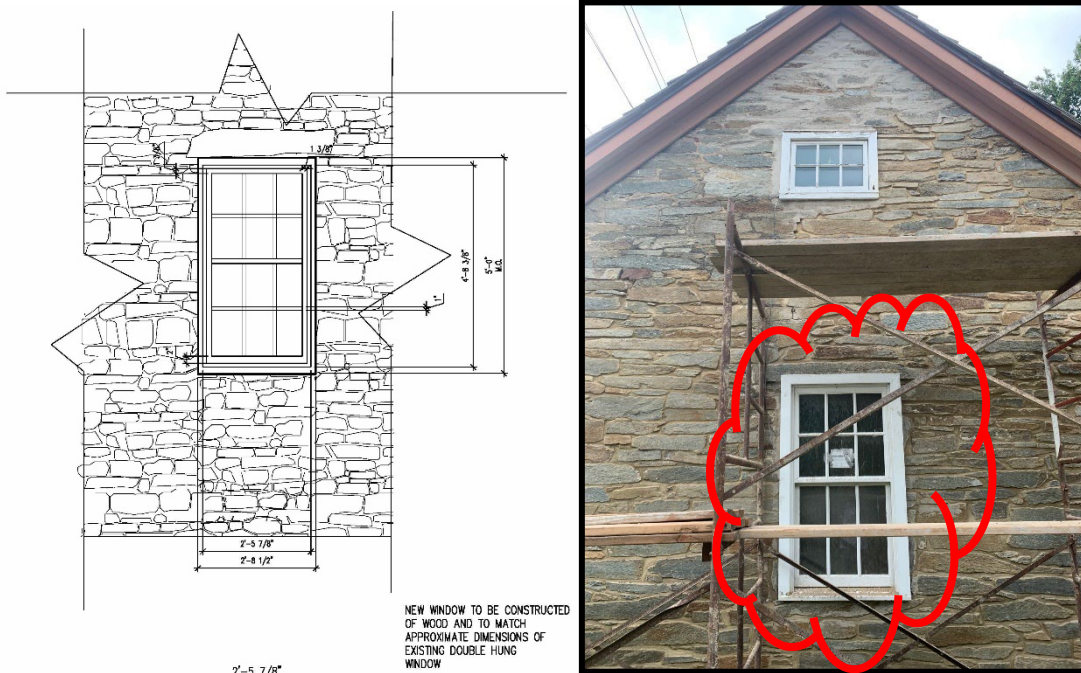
The drawing for the 6/6 window on the right-side elevation and a recent photo of it.
